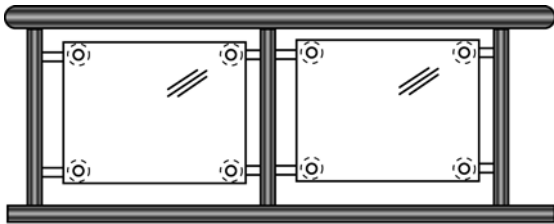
a Type III: Point Fixed Glazing System—Glazing as Infill
